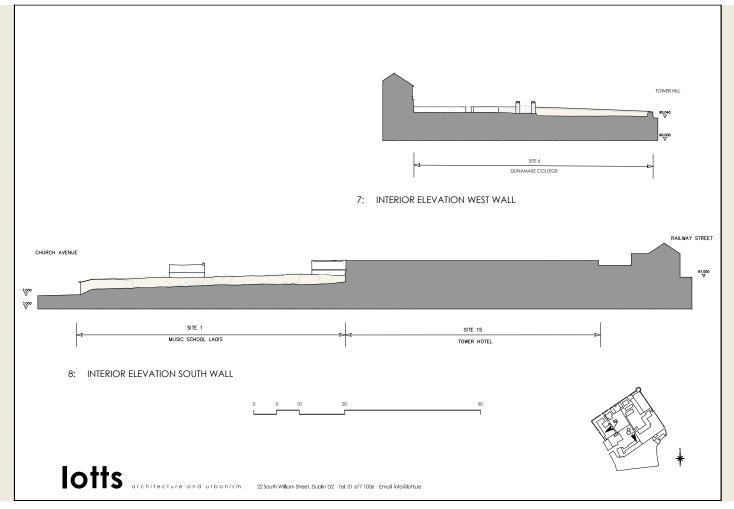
Survey drawing (interior elevantion West Wall and interior elevation South Wall)
